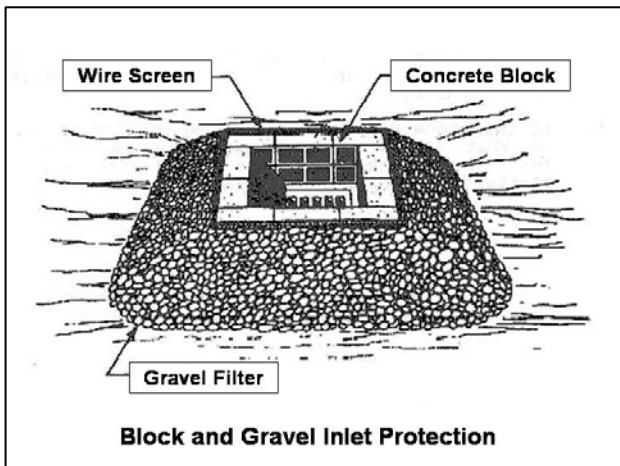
Typical Details of Block and Gravel Inlet Protection
